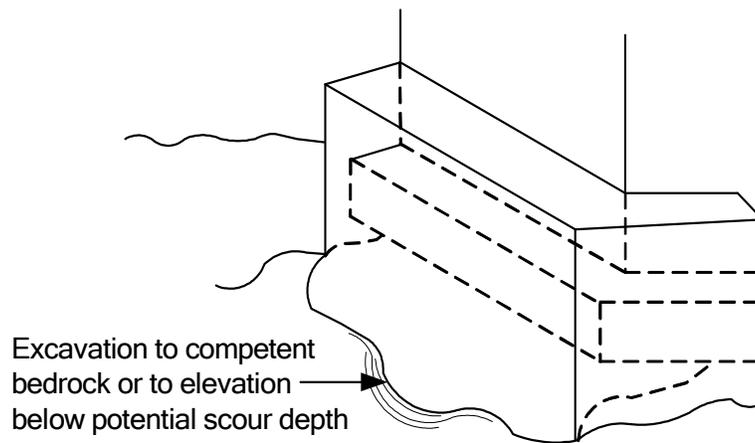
Concrete Footing Apron to Protect a Spread Footing from Undermining
